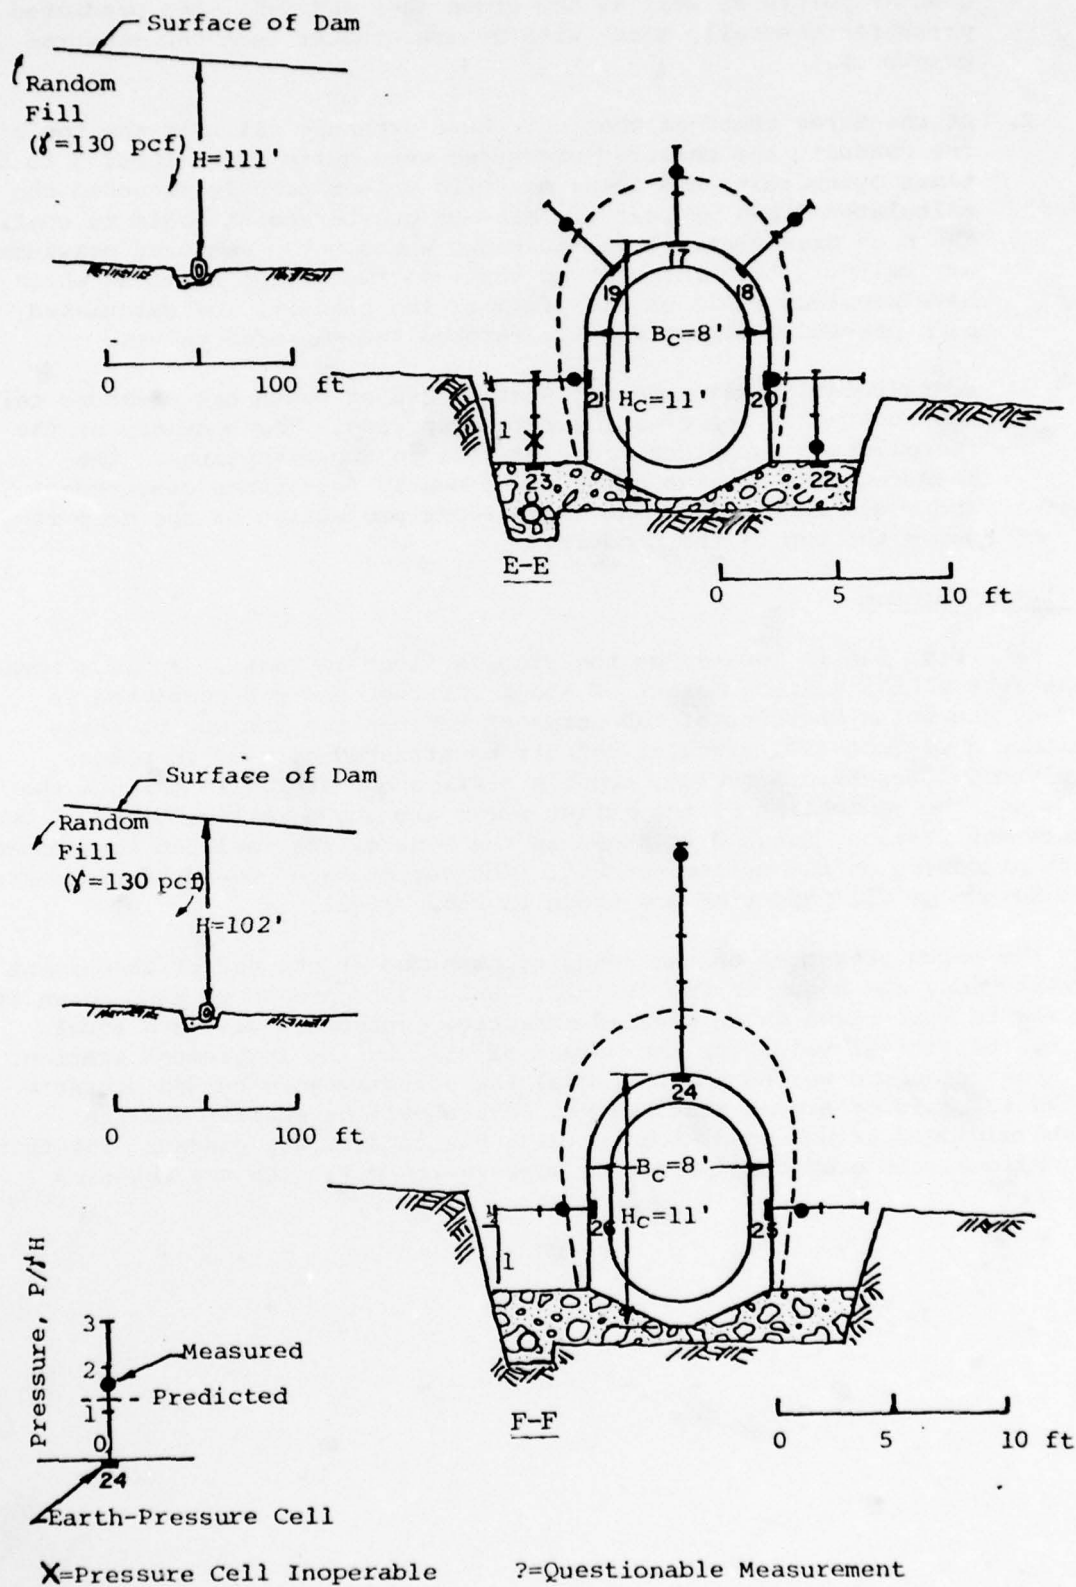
EARTH PRESSURES AT END OF CONSTRUCTION, INSTRUMENT STATIONS E-E AND F-F, DIERKS LAKE DAM
